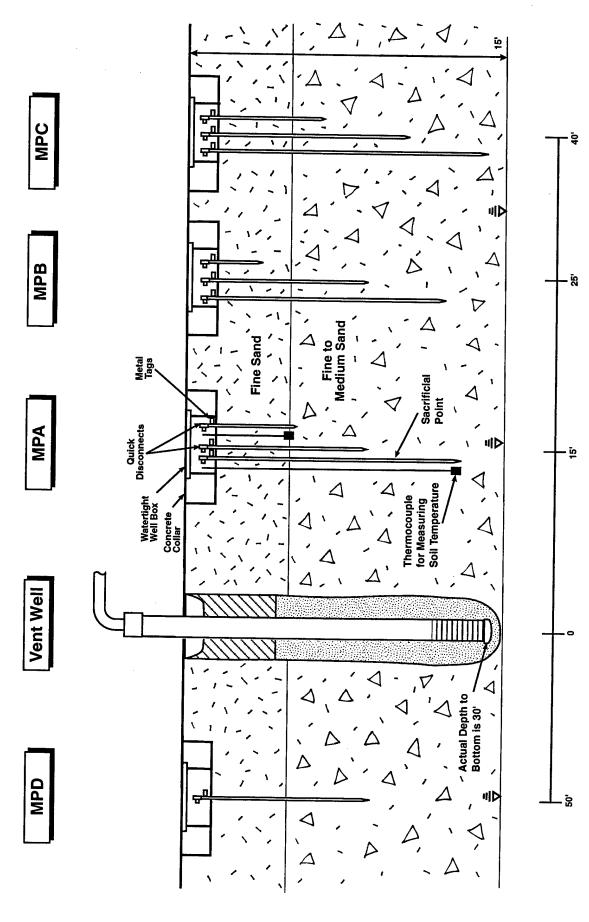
Cross Section of Vent Well and Monitoring Points at Buildings 7701 and 7705 Site Showing Site Lithology and Construction Detail (not to scale)
